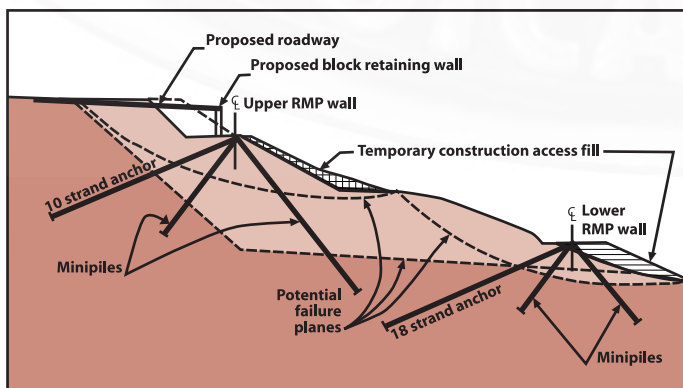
Diagrammatic cross section through Blue Trail Slide showing placement of micropile and tieback reinforced walls to stabilize the slide area. Modified from Turner and others (1998).
